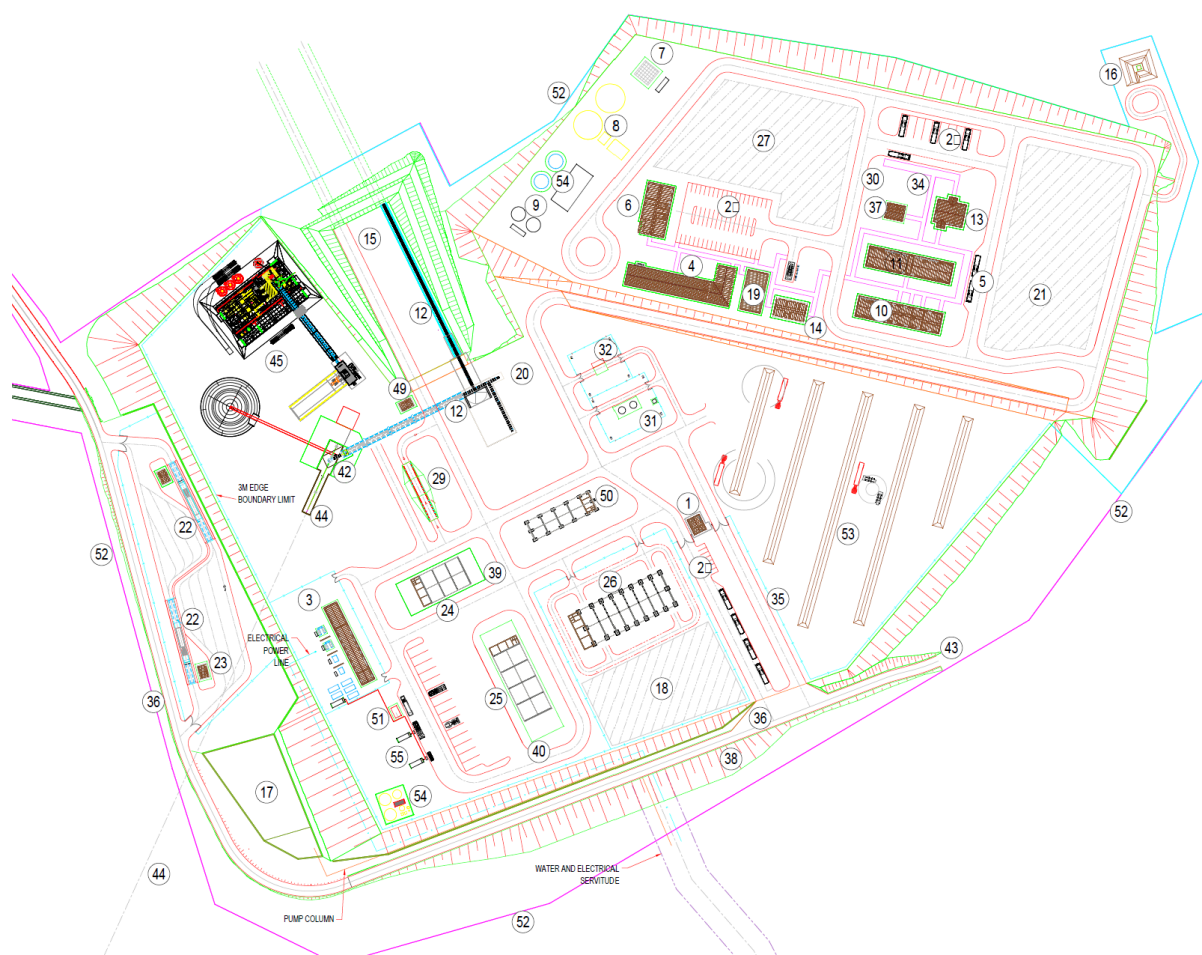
Proposed Layout of Surface Mining Infrastructure
